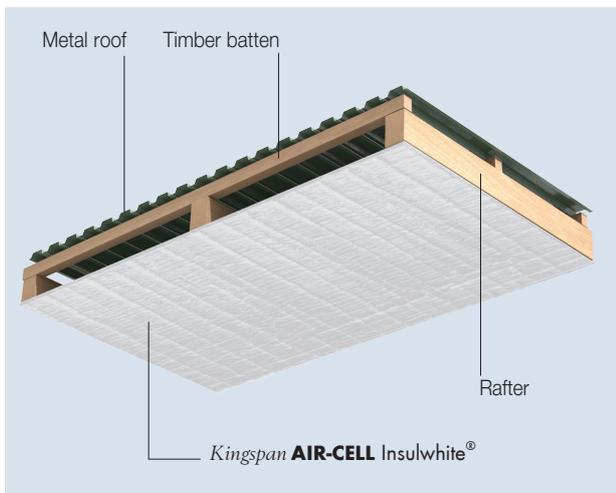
Kingspan AIR-CELL Insulwhite® in a pitched metal roof retrofit installation (attic conversion)
